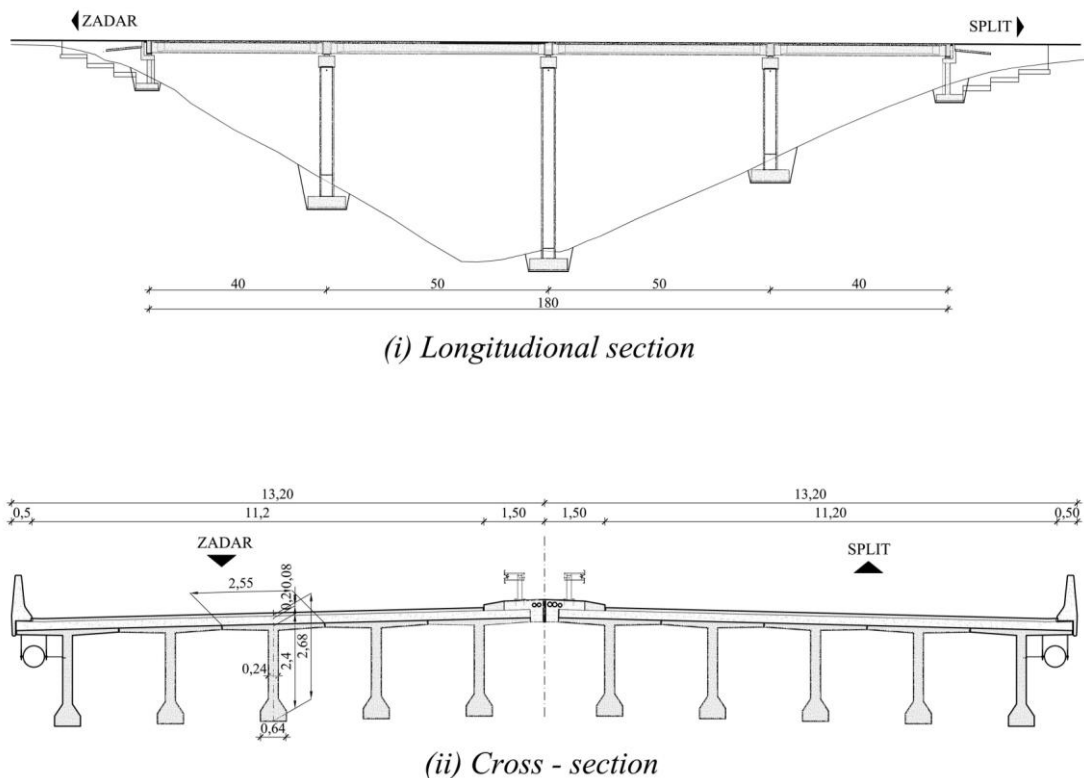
Longitudinal and cross – section of the Kličevica Bridge
